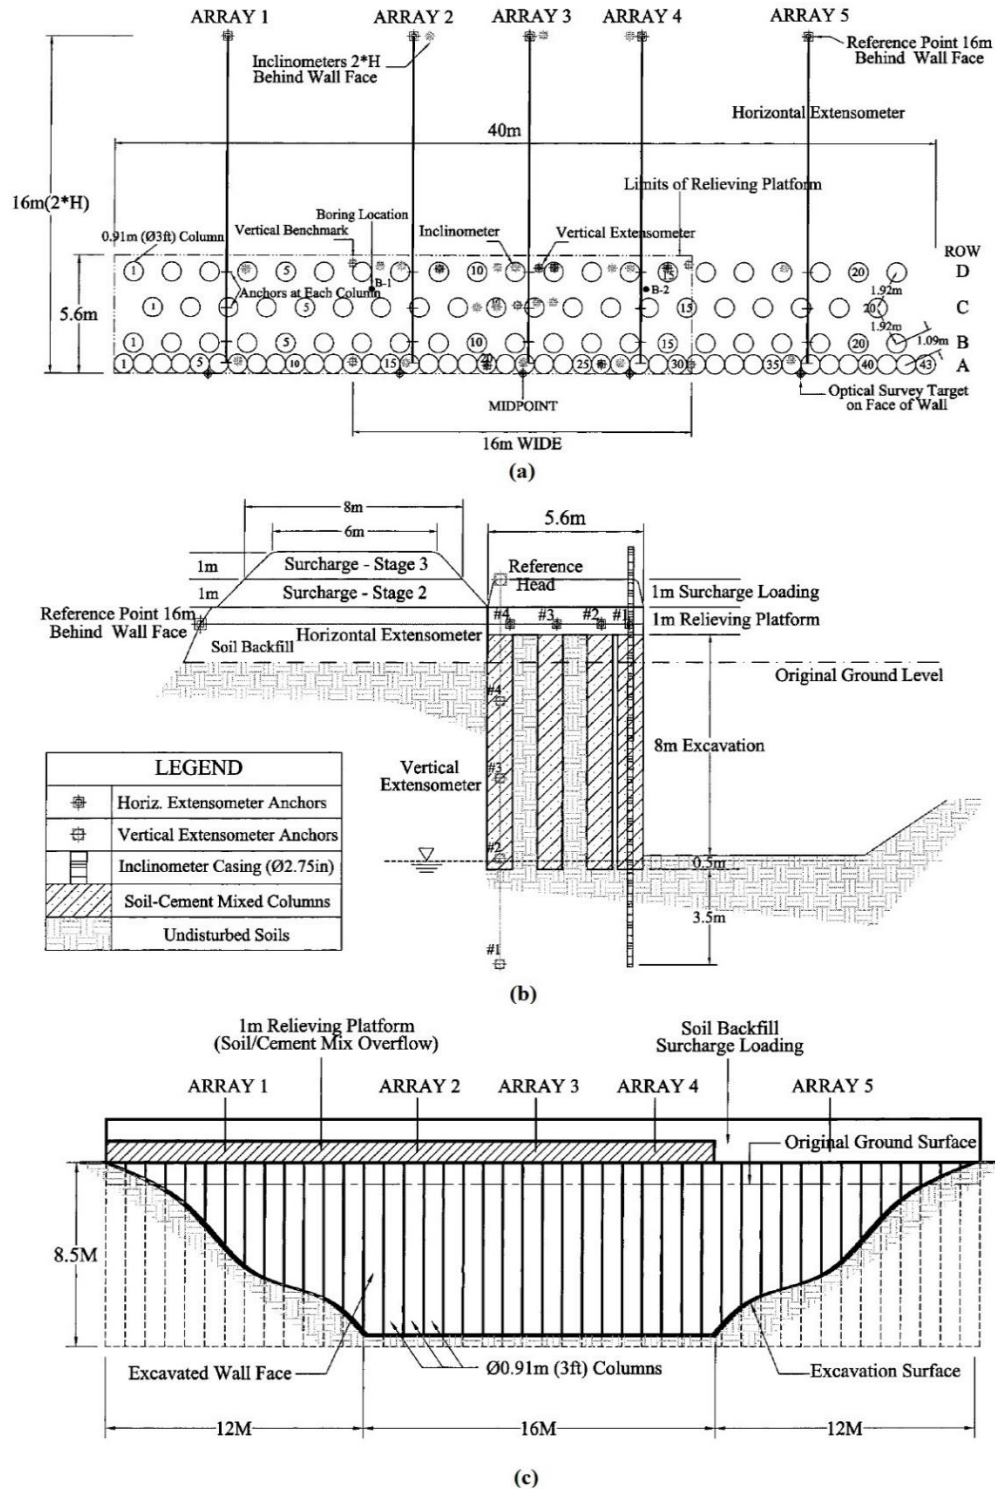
VERT wall a) plan view, b) cross section, c) front view (Lee, Briaud, 1999).
